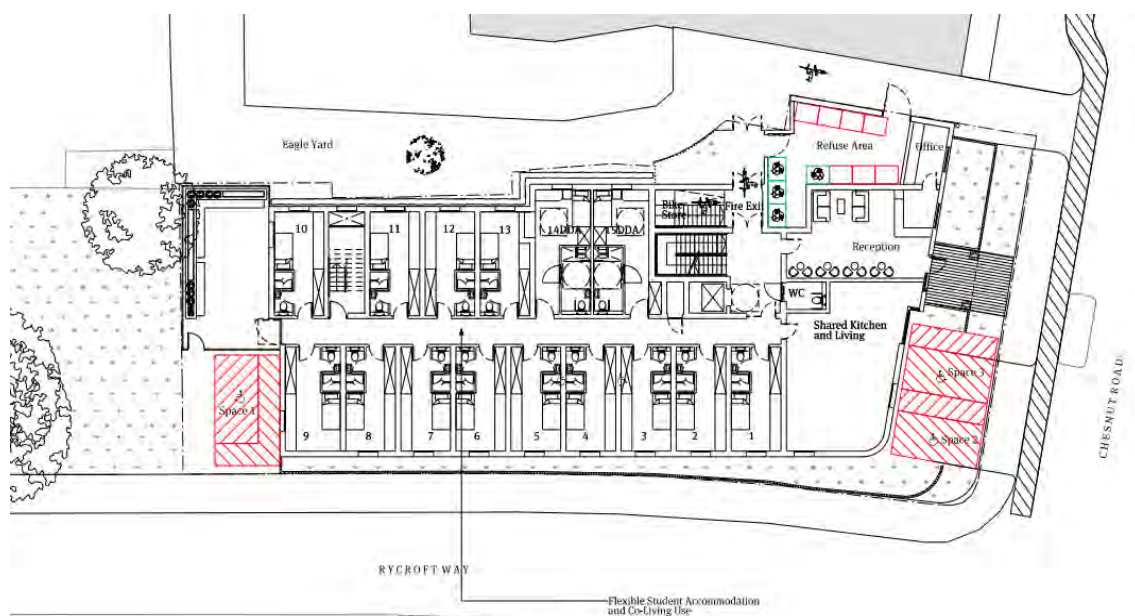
Proposed Ground Floor Plan 'Flexible Student Accommodation and Co-Living Use'
